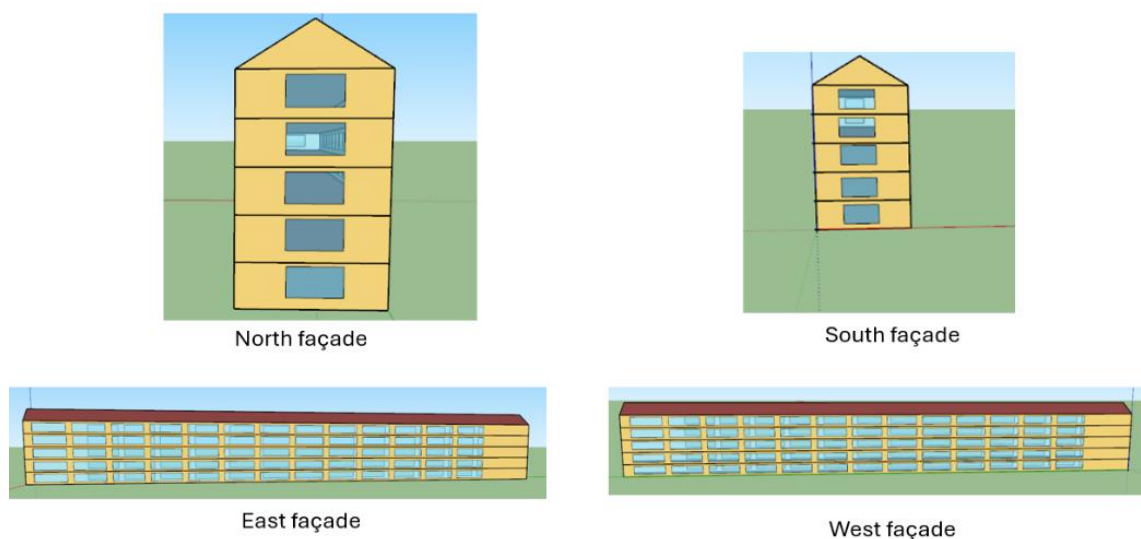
Facades of the reference building of the first building archetype (1970s residential building) for the Copenhagen district.
